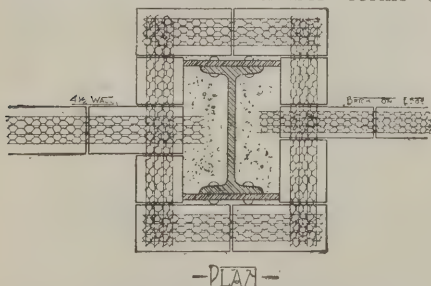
REINFORCED BRICKWORK IN CONNECTION WITH STEELWORK.
